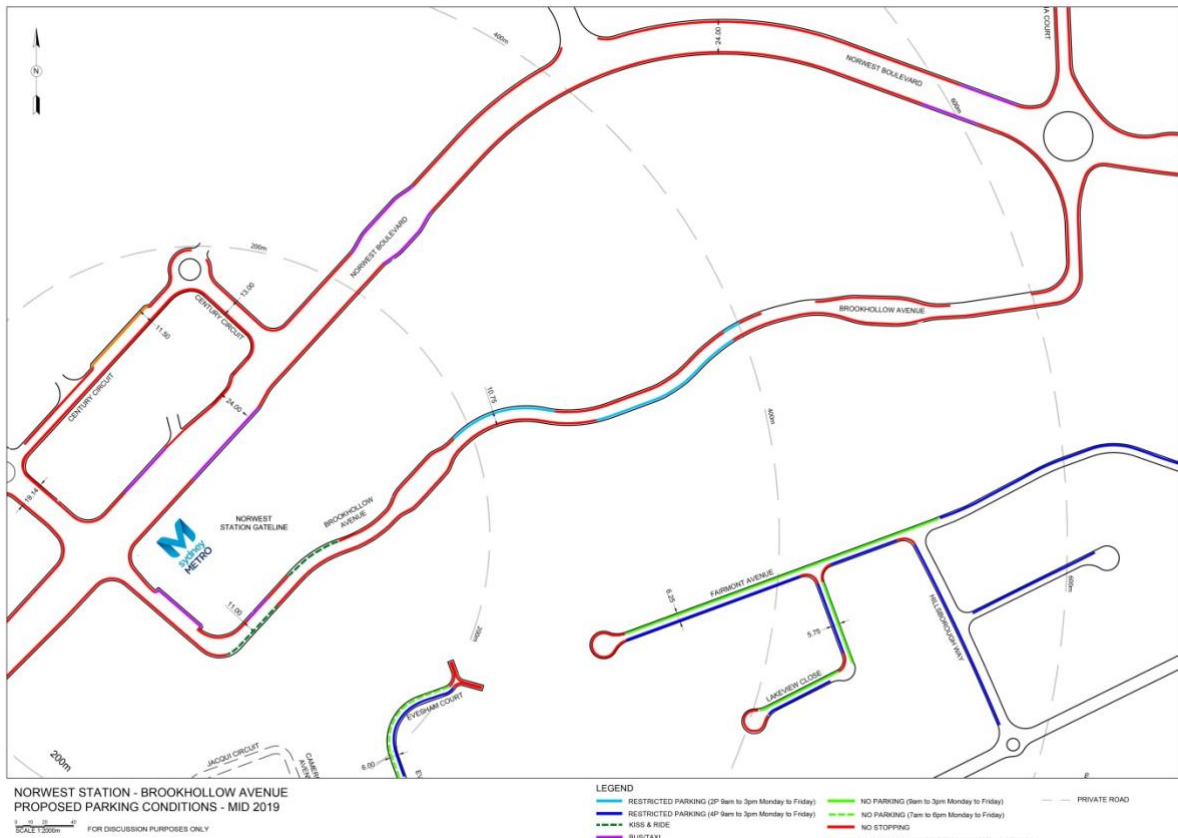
Proposed parking conditions mid-2019 – Brookhollow Avenue and Fairmont Avenue
